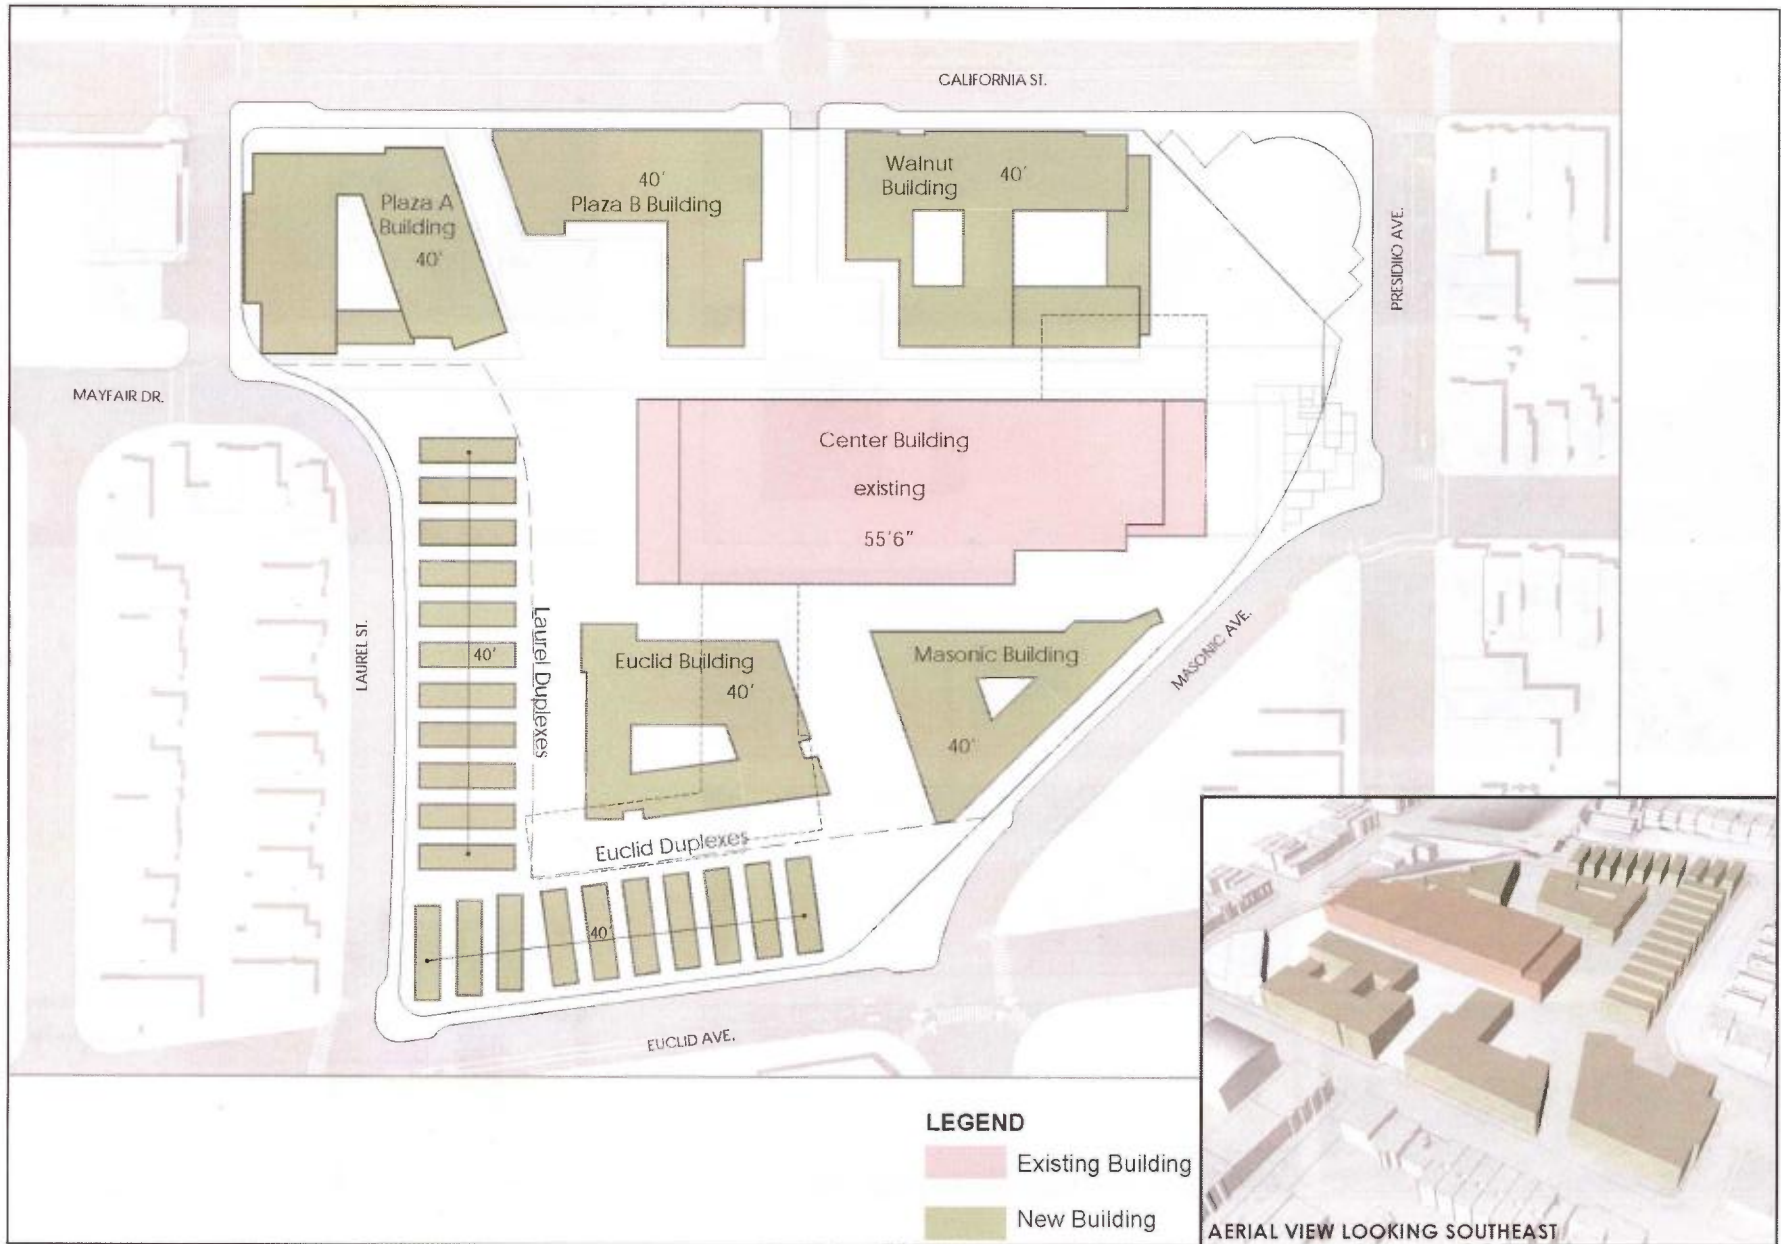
ALTERNATIVE E: PARTIAL PRESERVATION - RESIDENTIAL ALTERNATIVE SITE PLAN
